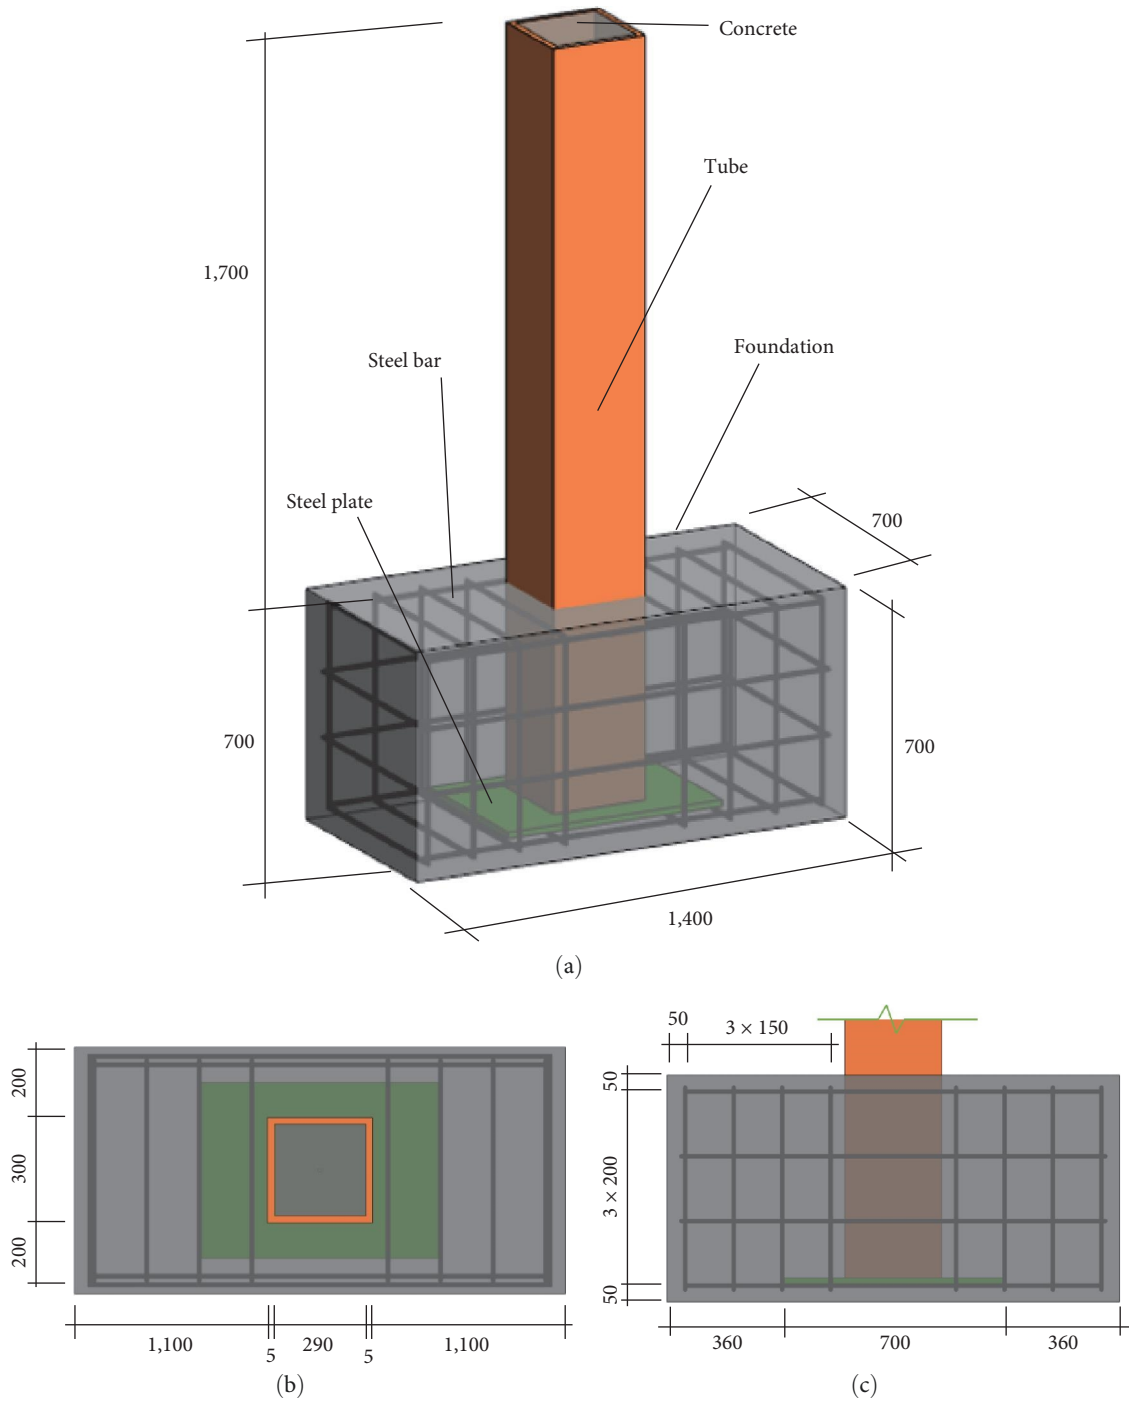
Schematic of specimen No. 1 (mm): (a) details of the specimen, (b) cross-section, and (c) steel bars arrangement.
